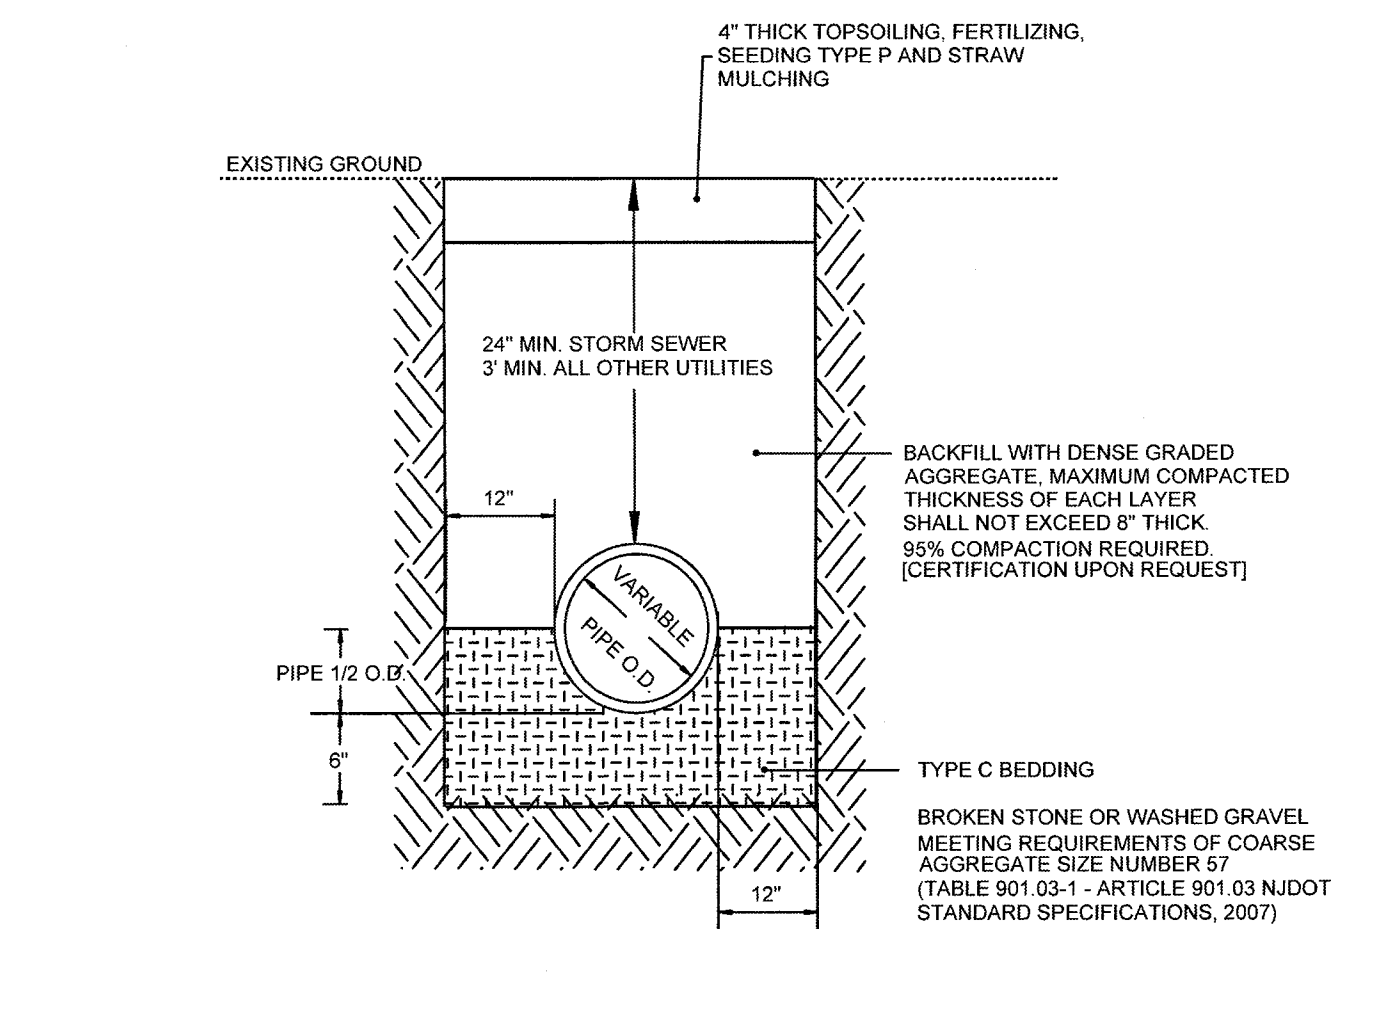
STORM SEWER TRENCH AND BEDDING DETAIL (PAVED AREA)
